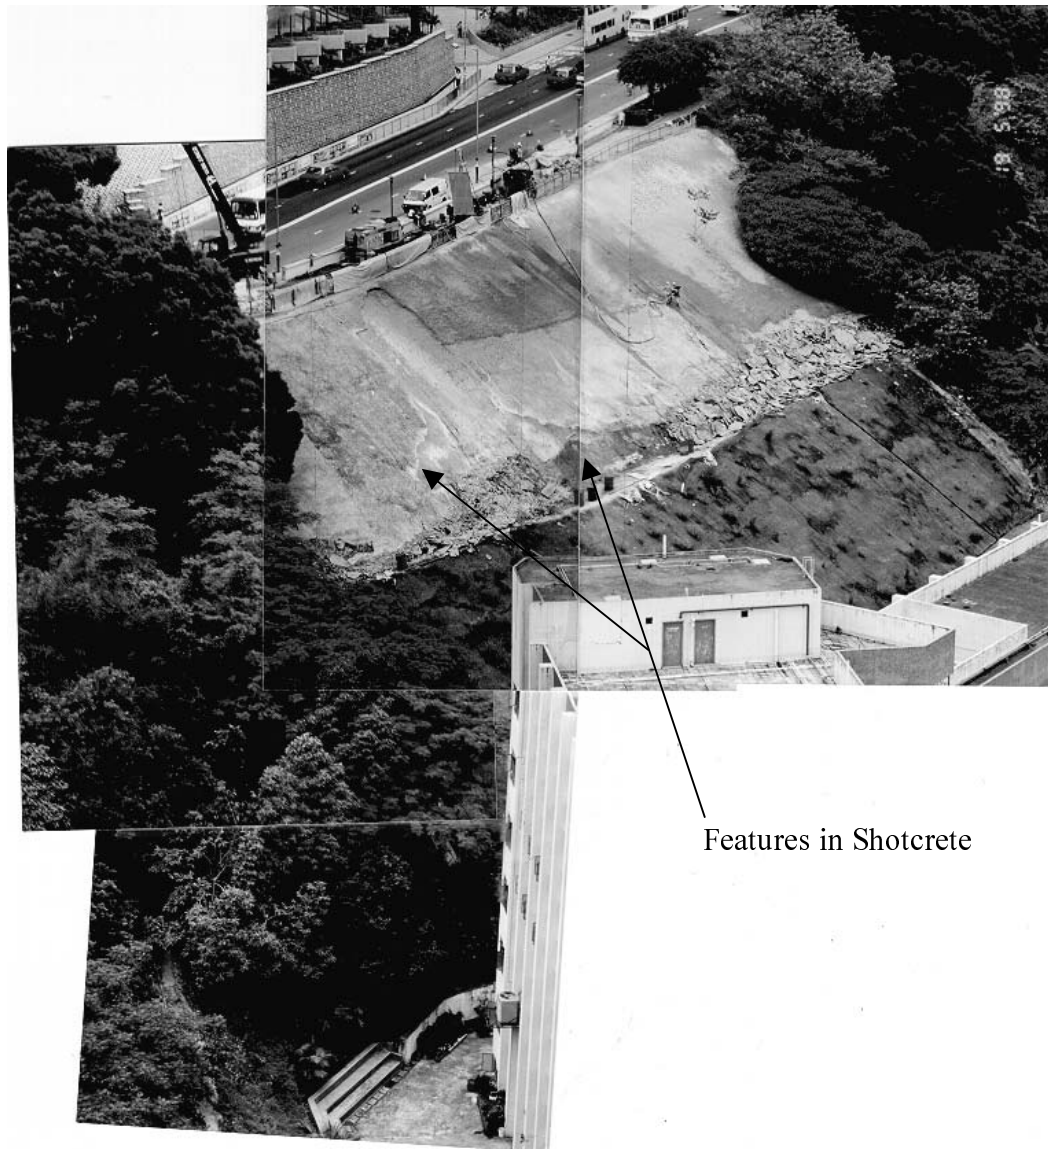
View East Across Slope No. 11NE-D/F10 of Remedial Works in Progress. Some Indication is Given of Extent of Removal of 1995 Application of Shotcrete by Spoil on Berm and Extent of Removal of Previous Hard Surfacing by Features in Shotcrete. (Photograph Taken on 19 May 1998)
